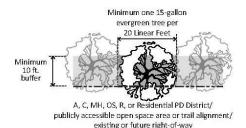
N.1.B: STREET FRONTAGE AND REQUIRED YARD LANDSCAPING
